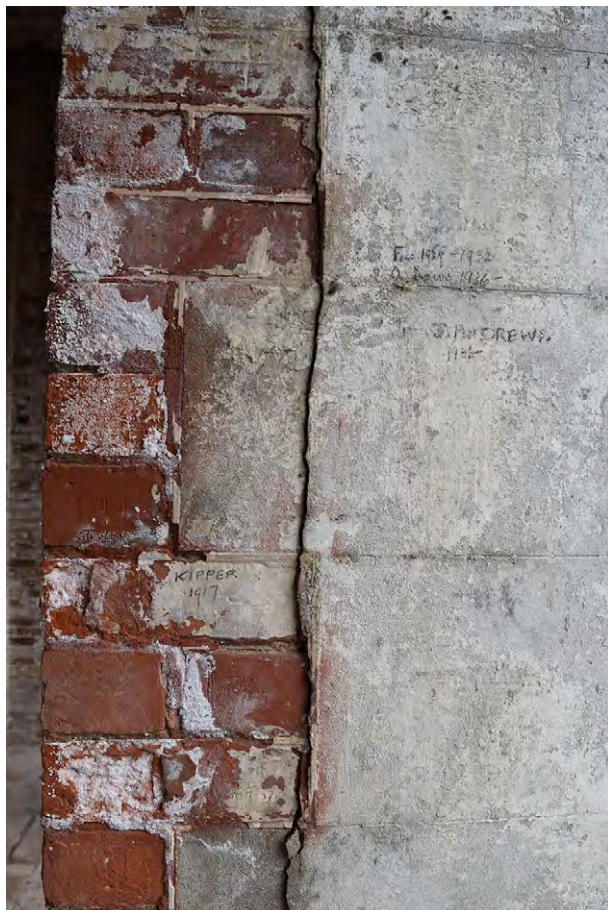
Graffiti on door jamb of West Fernery, looking east
